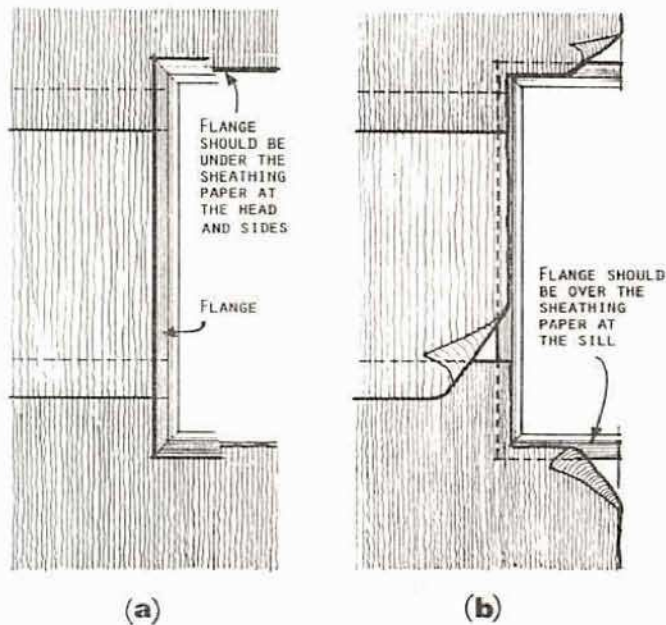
FLANGE MOUNTED METAL WINDOWS
